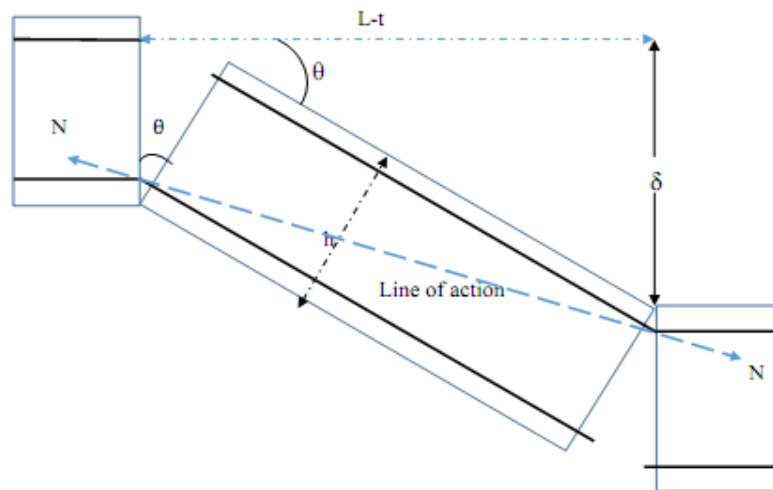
Deflected shape of single bay beam after bar fracture.
